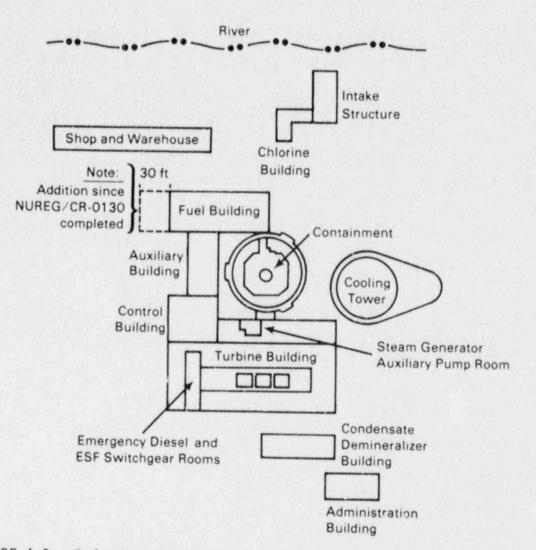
Reference PWR Plant Layout Showing the Extension to the Fuel Building
